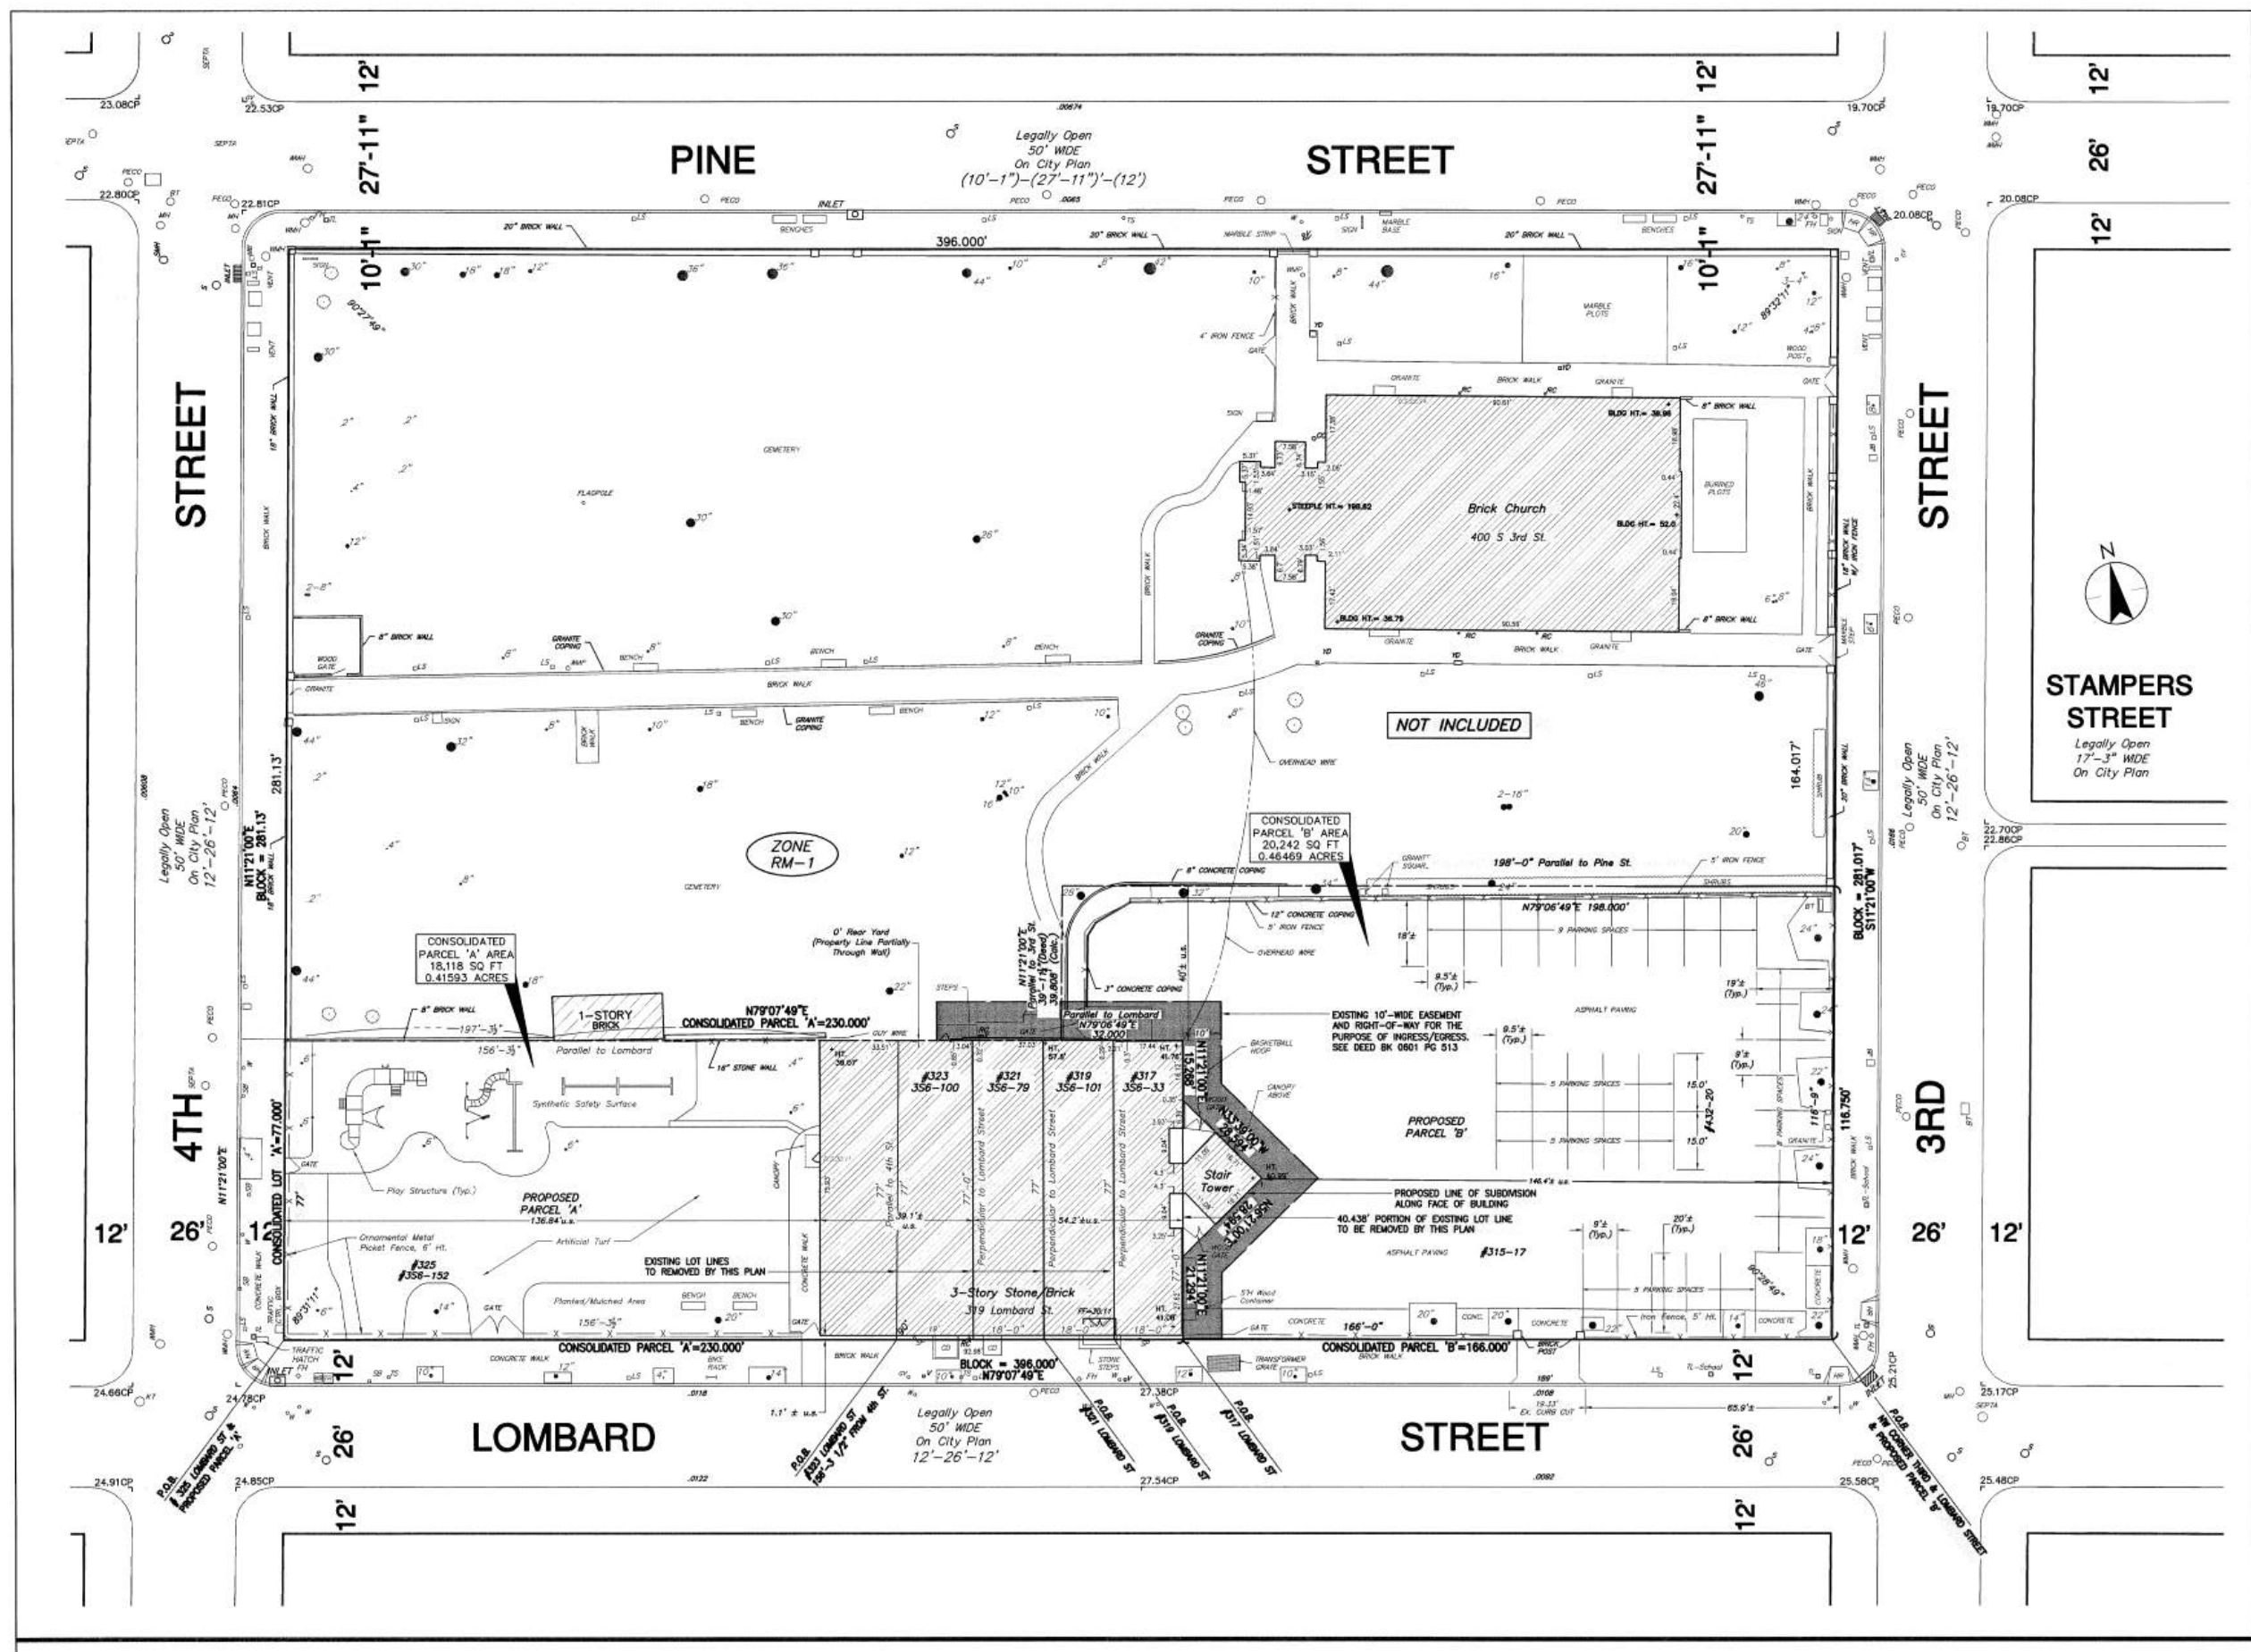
Site Plan Showing Limits of Archaeological Study Area (outlined). Scale: 1 inch = 45 feet (approximately). Source: Stantec 2015, Lot Consolidation/Subdivision Plan.
